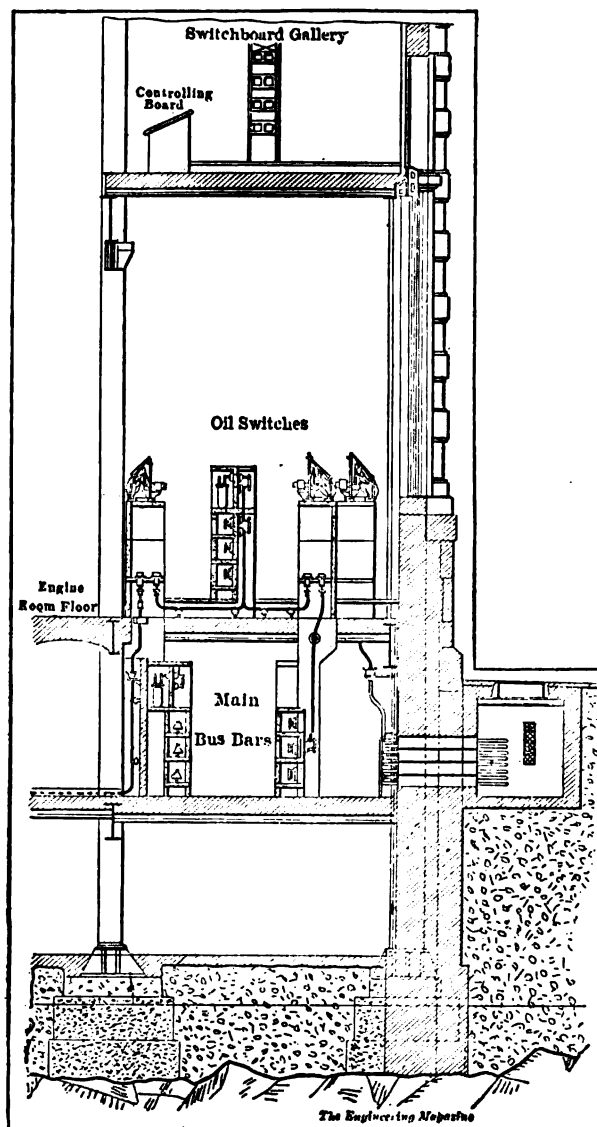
Cross-Section through Switch Room, 59th St. Plant, New York.
